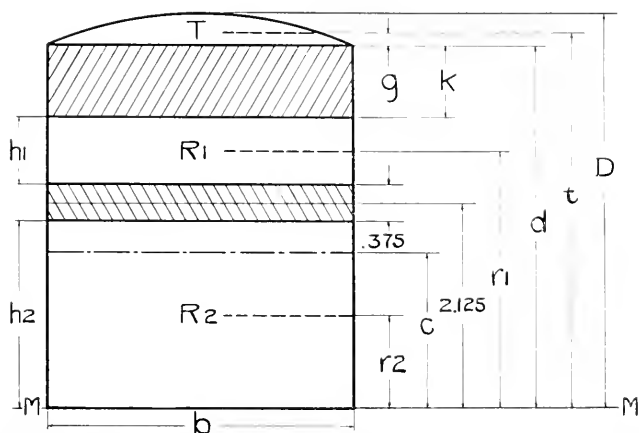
Brace bolt hole section containing a $\frac{3}{4}$ inch knot located immediately below the top segment (knot and bolt hole shaded).
